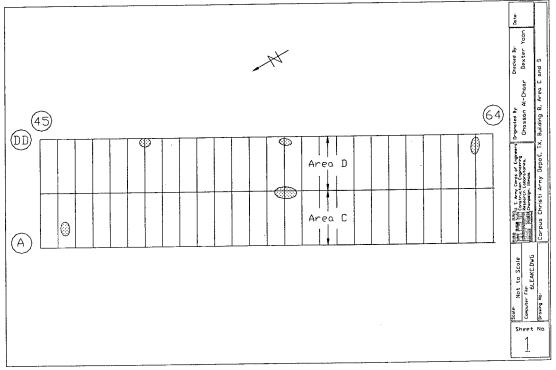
Location of leak traces and roof surfaces collecting water in Areas C and D.
